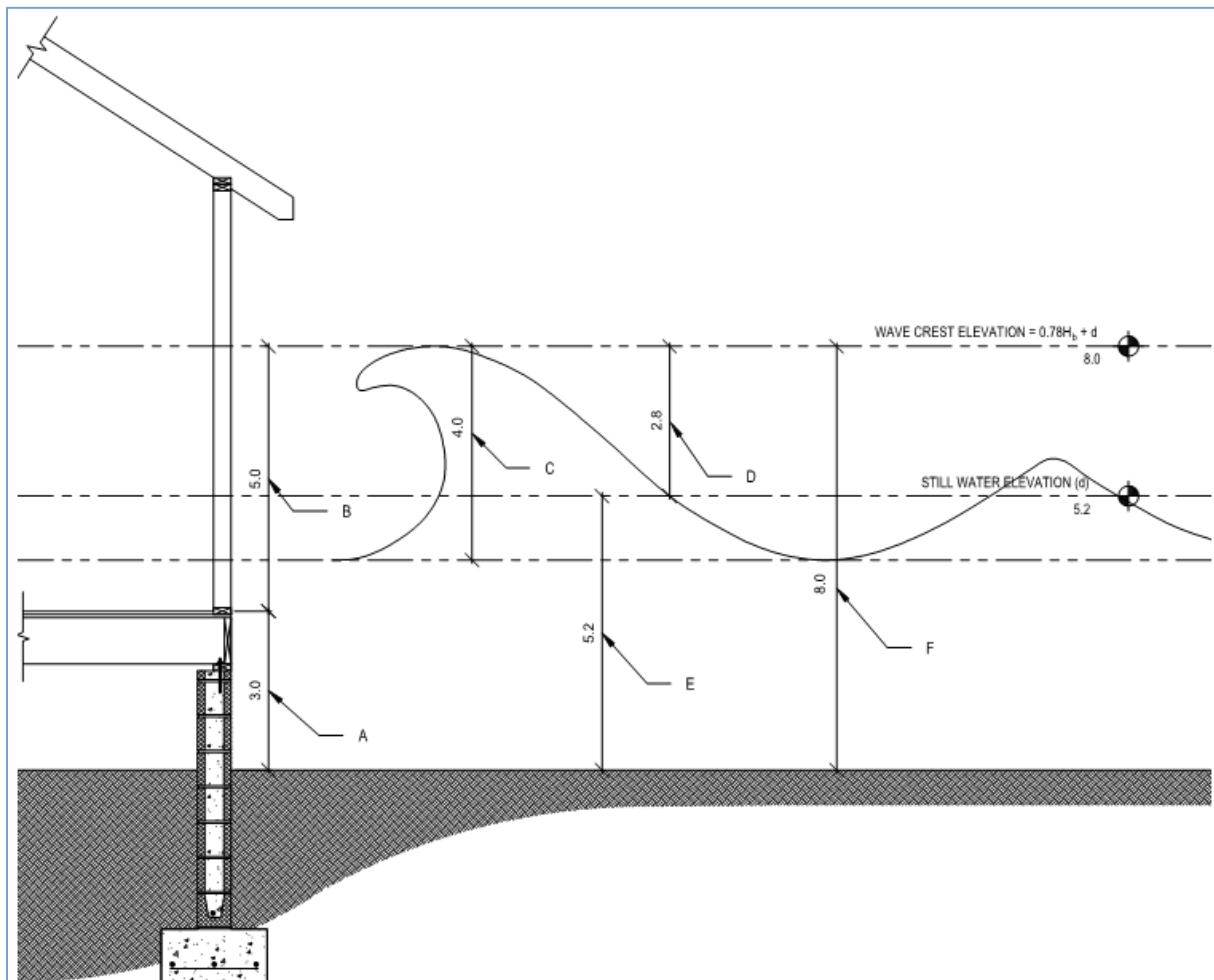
Illustration of Maximum Wave Damage Scenario, Prototype 5A Single Story Residence, No Basement, Most Likely Building Characteristics, Extended Foundation Wall
